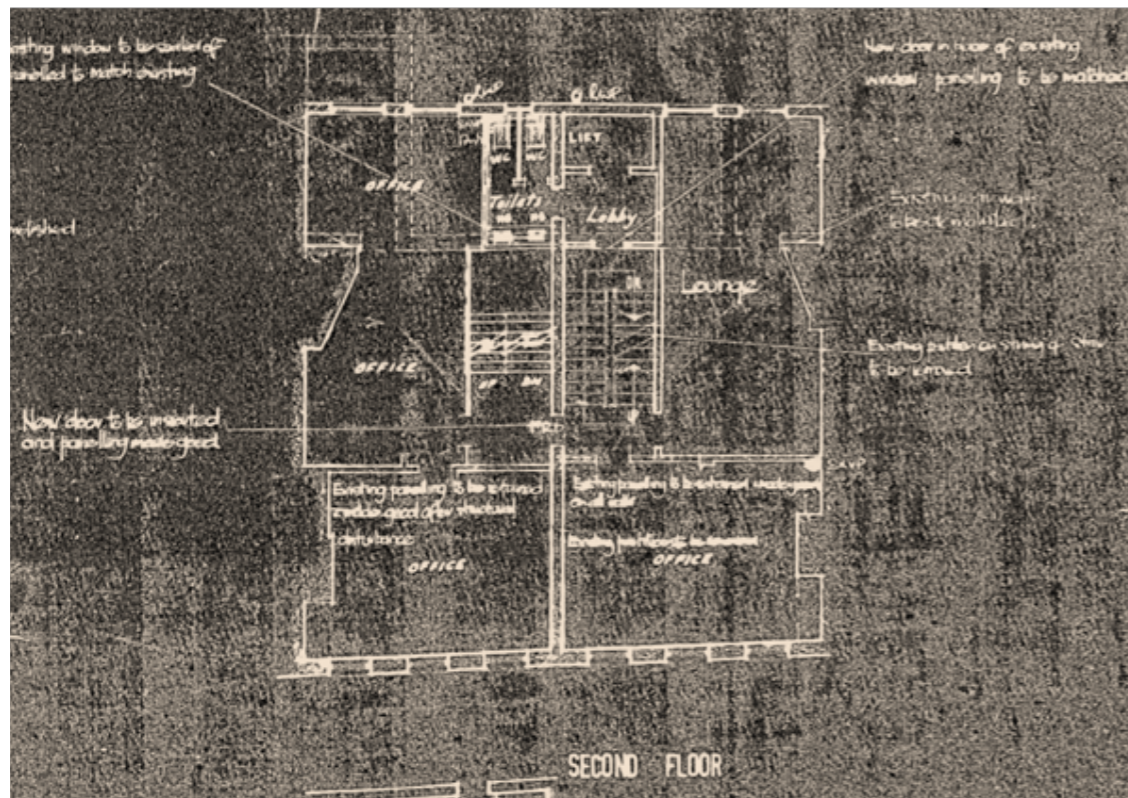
APRIL 1965 DRAWING FOR NOS. 14 AND 15 GREAT JAMES STREET, SECOND FLOOR (SOURCE: CAMDEN LOCAL STUDIES LIBRARY AND ARCHIVE).
